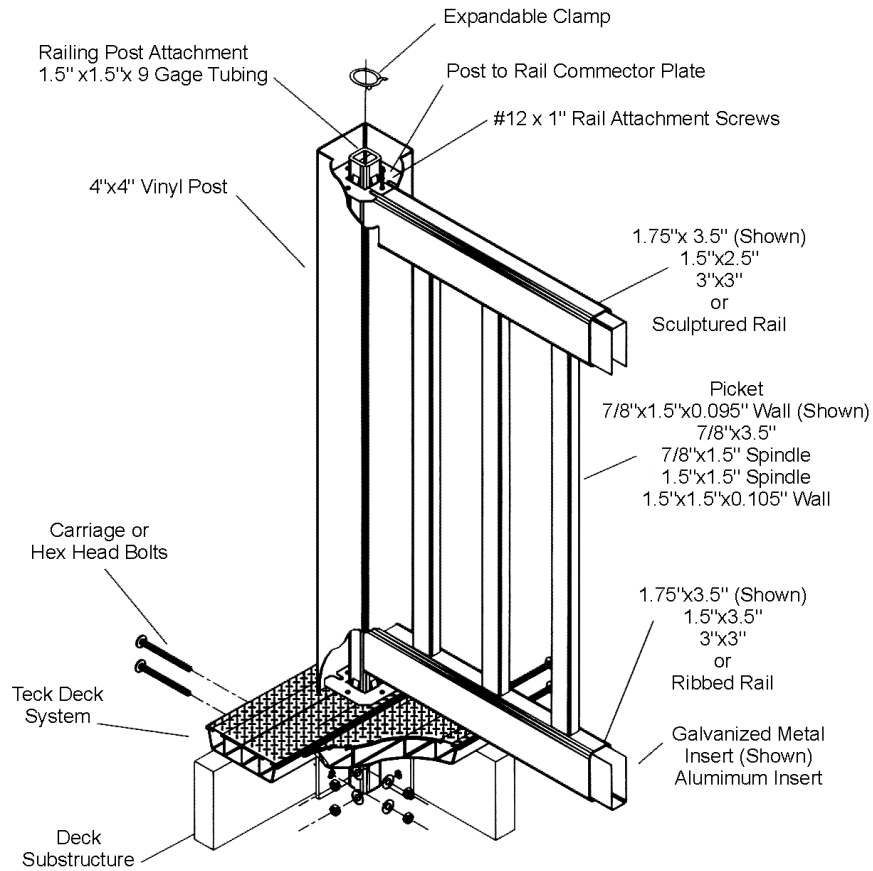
TECK DECK GUARDRAIL SYSTEM (WITH METAL POST INSERT AND WOOD SUPPORTING CONSTRUCTION)
